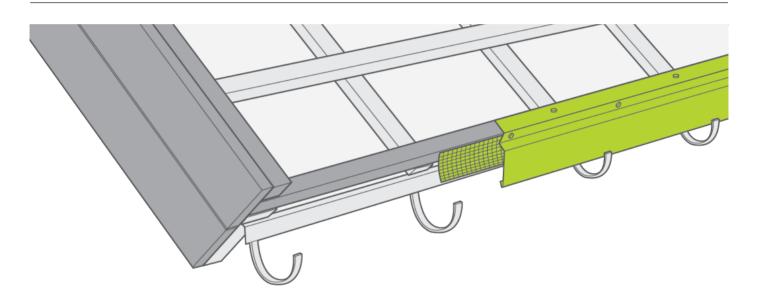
INSTALLING BIRD PROTECTION GRID AND EAVES FLASHING
